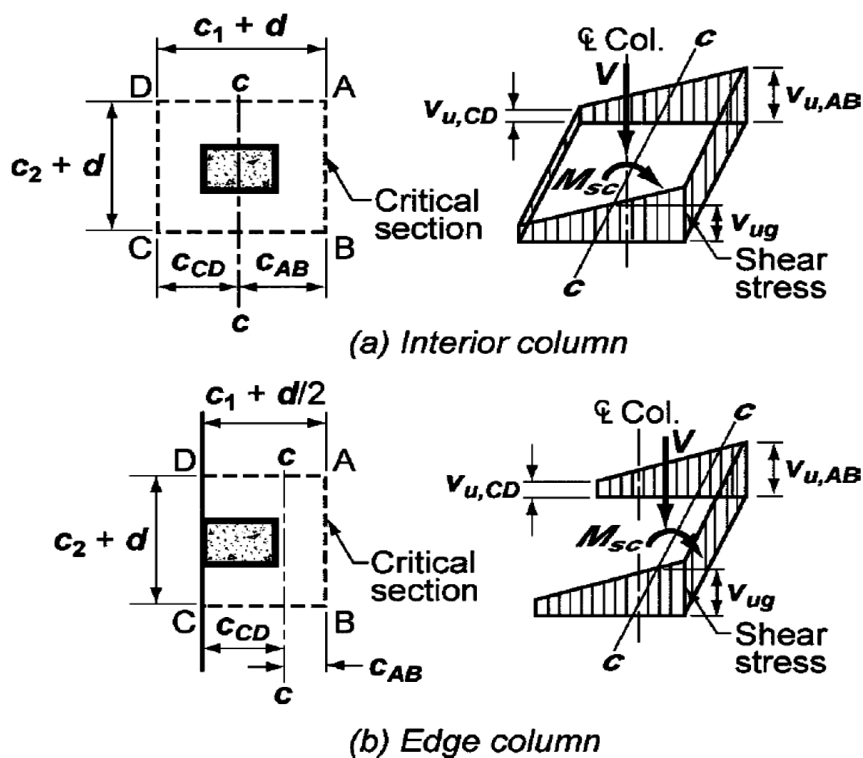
Assumed distribution of shear stress.
